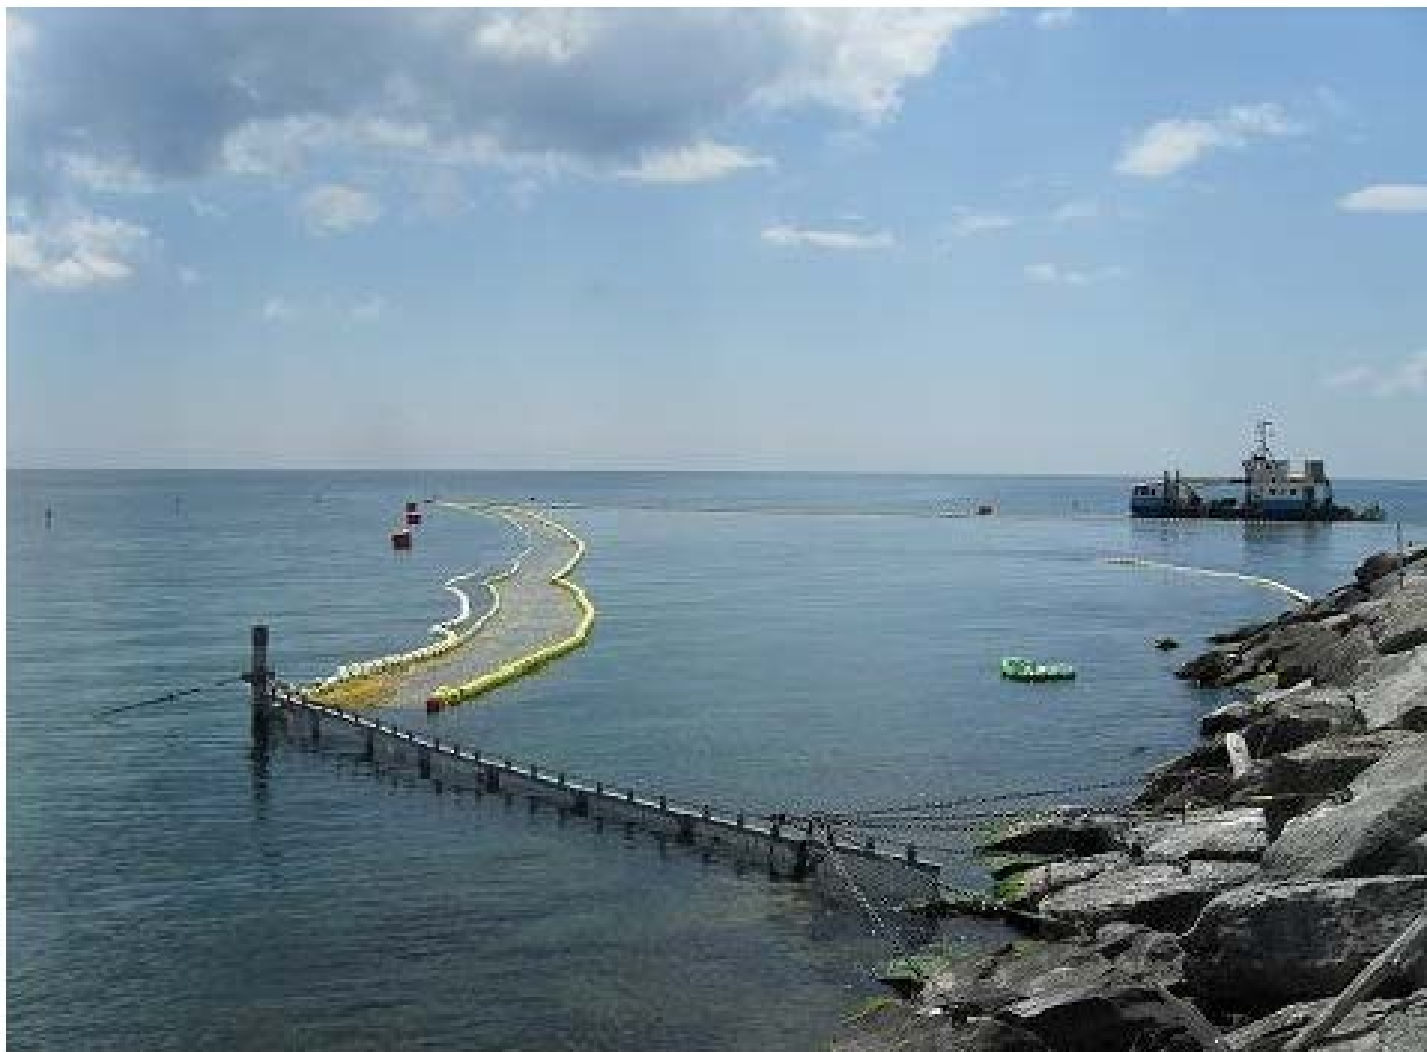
Photo of Installed Fish Diversion System from the East Side Looking West (OPG, 2012h)
